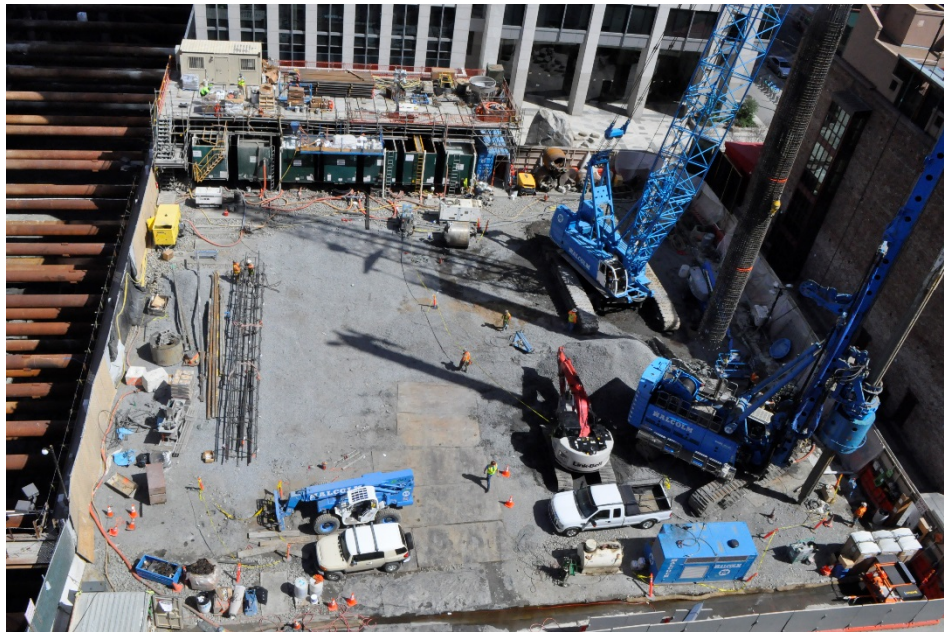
Overhead view of the 140- by 130-foot 181 Fremont site
